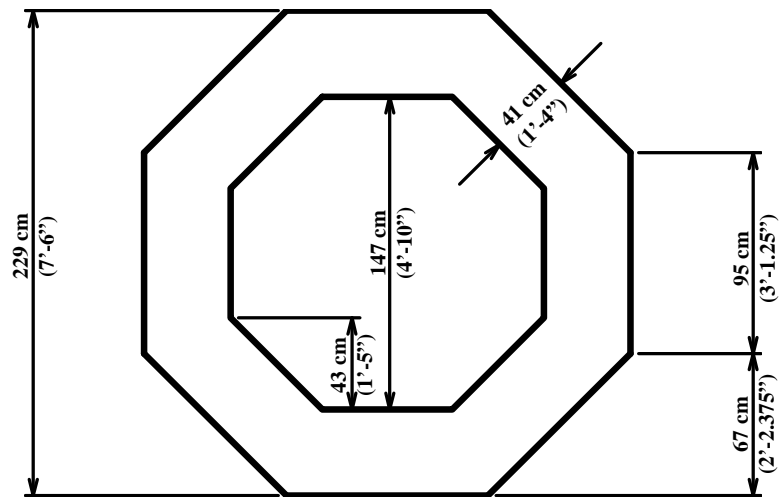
Dimensions for Ramp P typical segment cross-section
